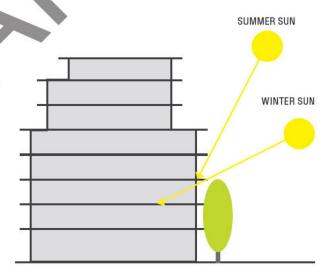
Providing shading structures (balconies or overhangs) or devices to block the summer sun while letting in the winter sun, particularly on upper levels where landscape shading is not possible
